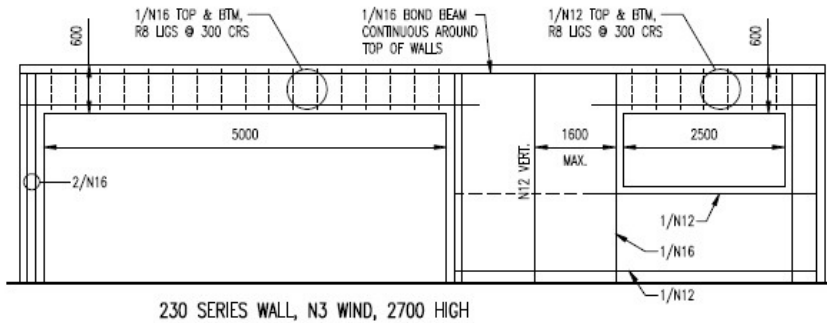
2700 High Wall, N3 Wind Rating, 230 Series ECO-Block (Max. roof load width: 10.0m)
